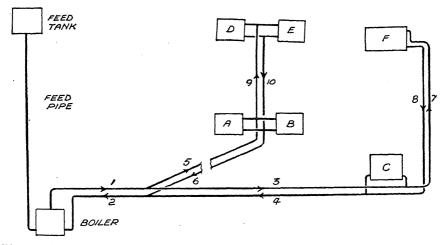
An arrangement of a typical two-pipe up-feed system for a private house installation
